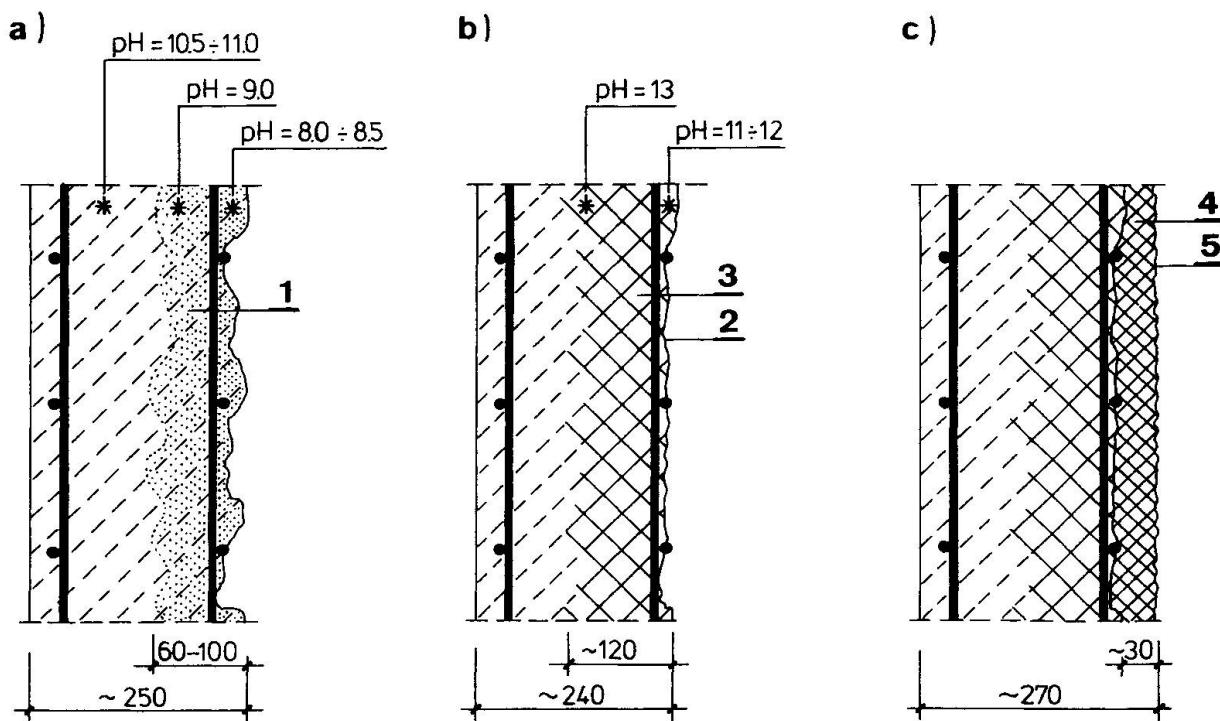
The steps of reconstruction: a) - damaged wall, b) - after sand-blast cleaning and alkalization, c) - after full reconstruction;
